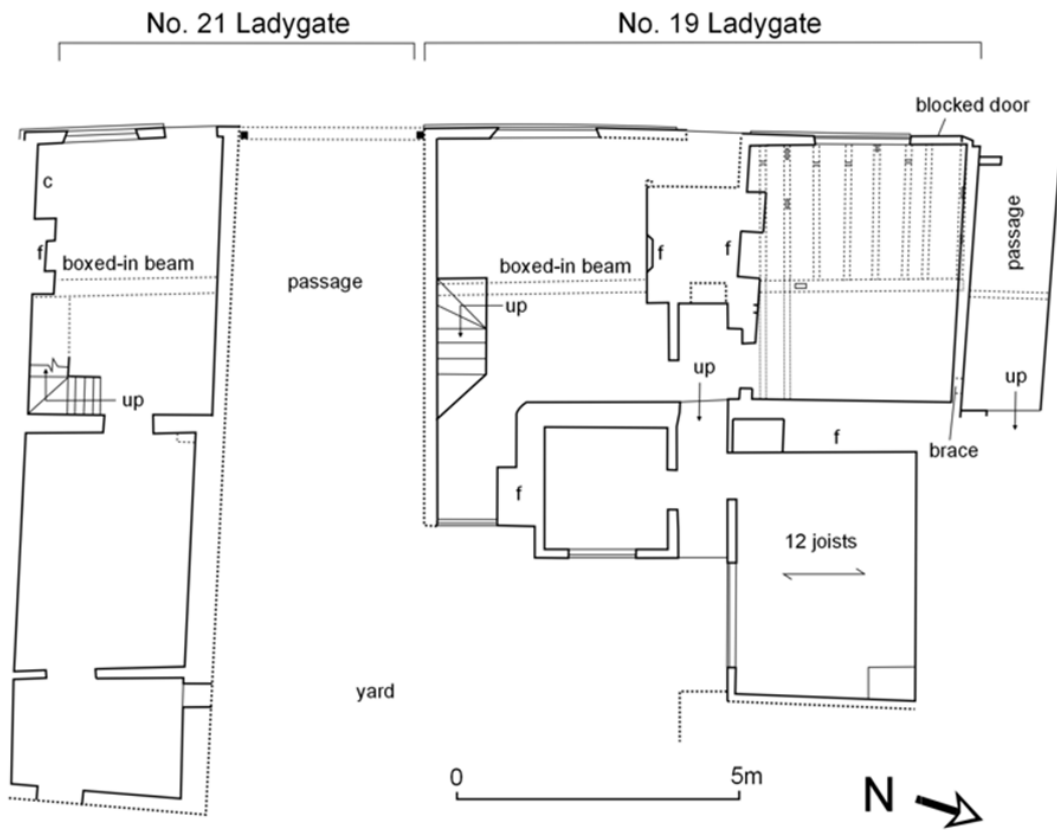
Ground-floor plan of 19–21 Ladygate (YVBSG 2016)
